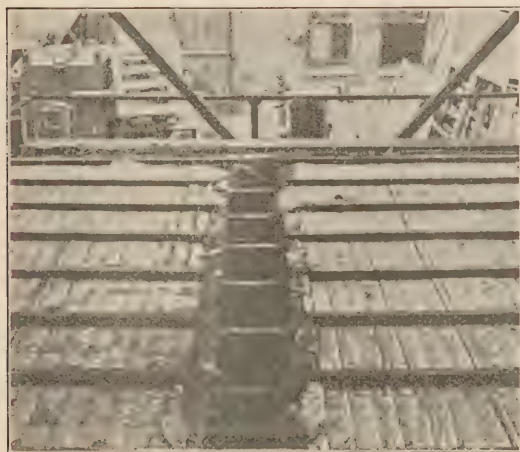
View of Floor and Ceiling Construction after Fire Endurance Test, Looking North at Top of Furnace. Brick load and top flooring removed, showing condition of 2 x 2-inch furring strip and of the insulation. Rough floor in the center strip was removed after test to permit inspection of joist and joist bay spaces.
